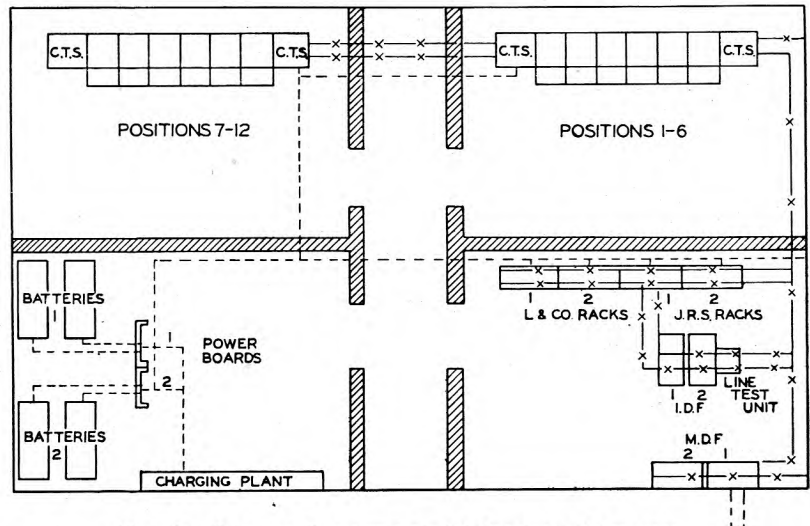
TYPICAL LAYOUT FOR 12-POSITION EXCHANGE.
